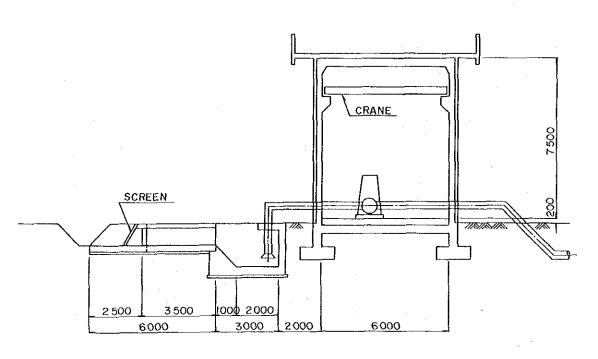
PLAN OF PUMPING STATION (AREA A)
